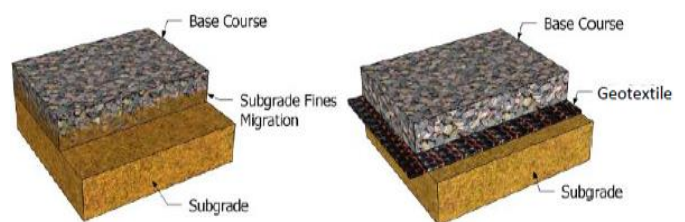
Geotextile as a separator (a) unreinforced pavement and (b) reinforced pavement [23]
